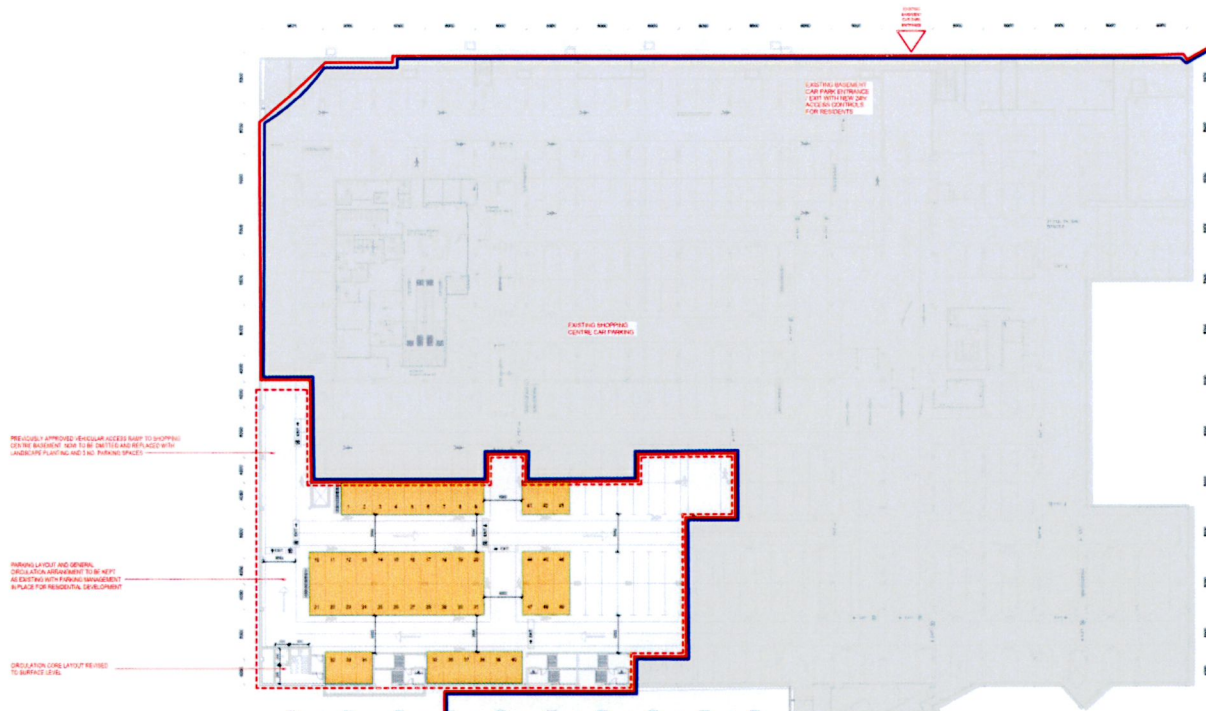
Proposed basement (existing layout with 49 spaces allocated to new residential)
